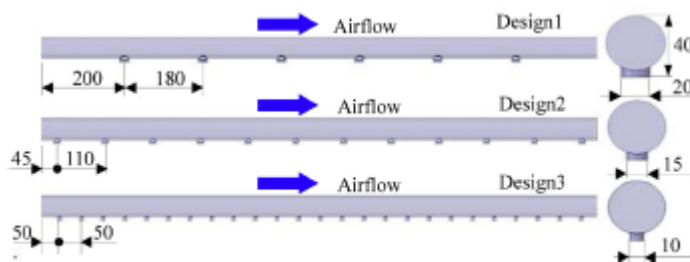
Proposed overhead perforated air tube design. Dimensions are in mm.
